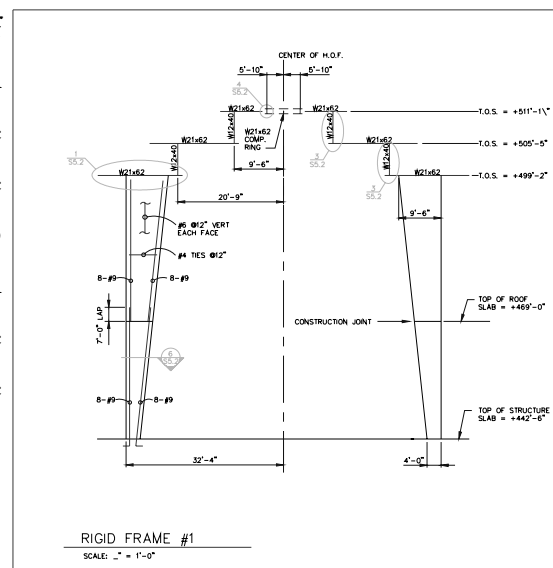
HALL OF FAME STAIR STEEP ROOF
